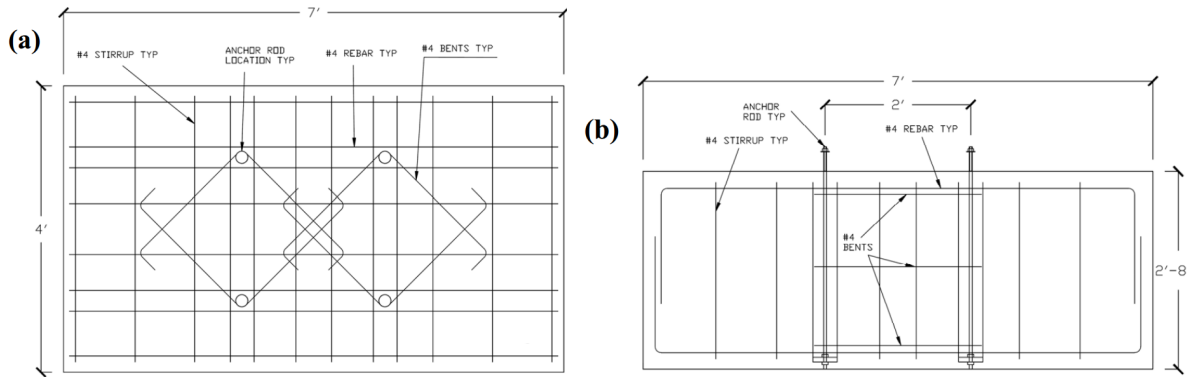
Schematic (a) plan view and (b) elevation view of reinforcing bar details used in the concrete pedestals for the anchor rod tests No. 4 and No. 5
